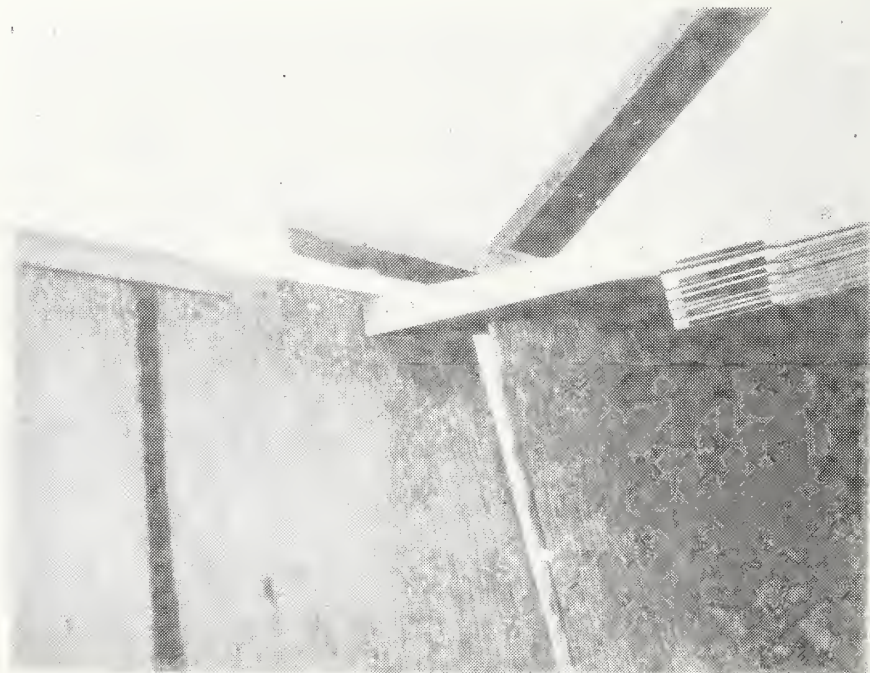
Loose Interior Paneling to Wall Framing Attachment
